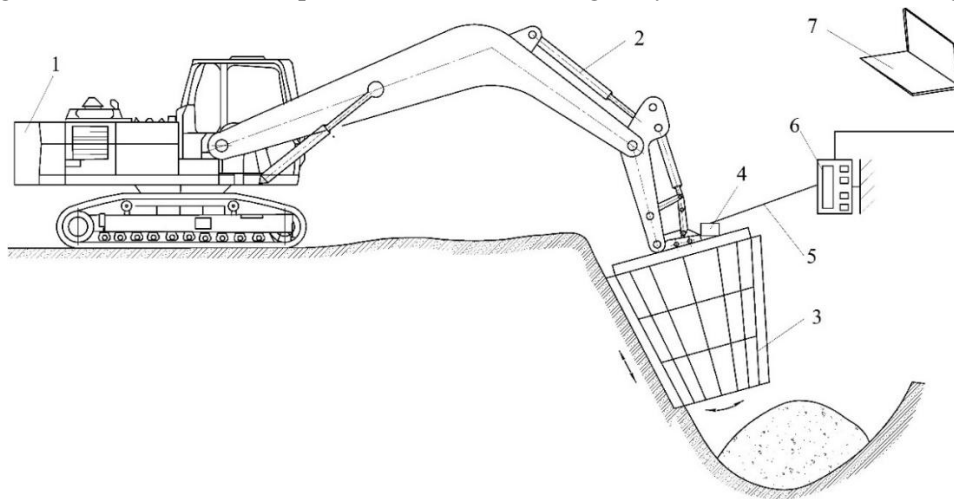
Diagram of the excavator's operation with the working tool for clearing damaged soil inside pits: 1 – excavator; 2 – excavator boom; 3 – working tool; 4 – load cell; 5 – cable; 6 – electronic dynamometer; 7 – laptop
